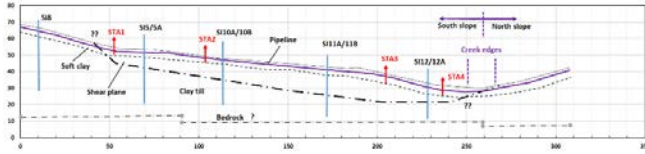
Section showing details of pipeline, slope, shear slip plane, slope indicators (SI), and strain gauge stations (STA)
